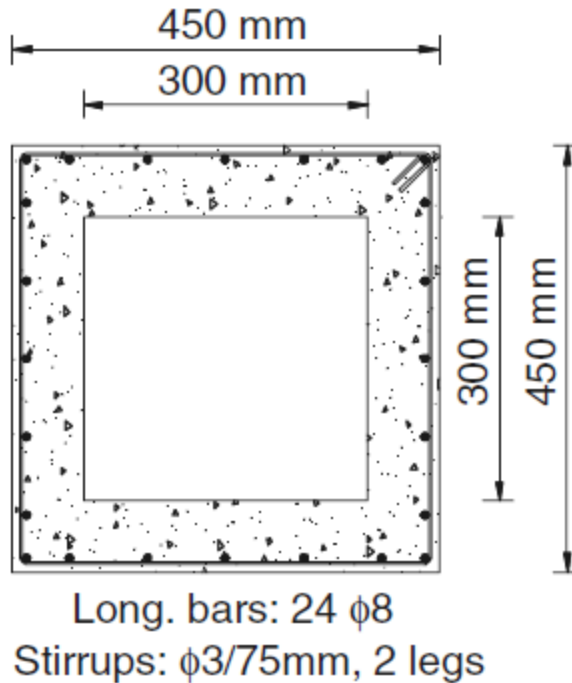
Cross-Section Dimensions and Reinforcement Layout of Square Hollow Columns with One Layer of Transverse Reinforcement Tested by Calvi et al. (2005), (1 mm = 0.0394 inch)
